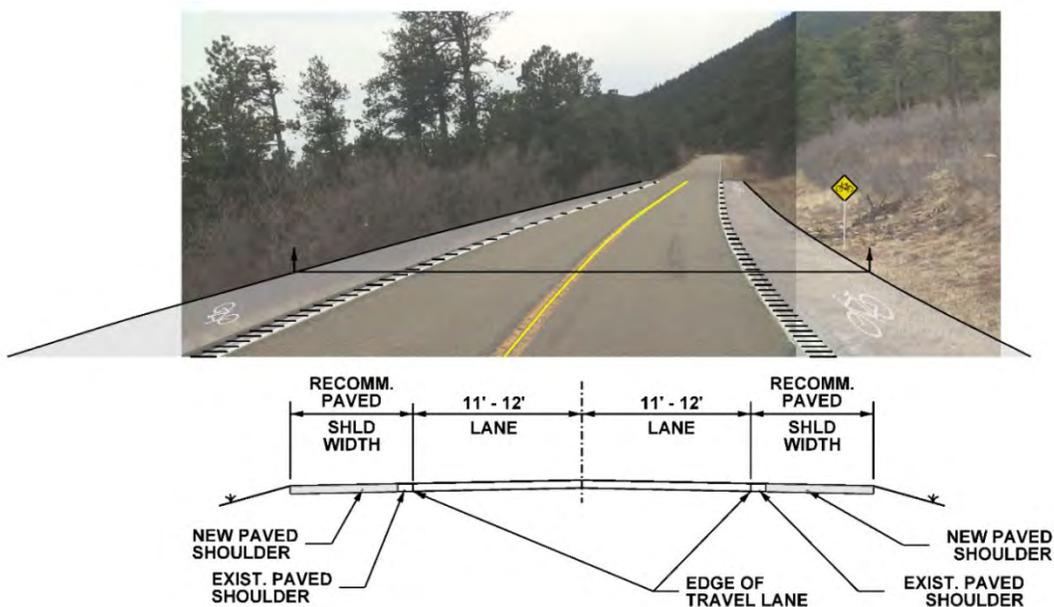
Mining Segment - On-Highway Trail (Attached) Concept Typical Section Location Near MP 50
